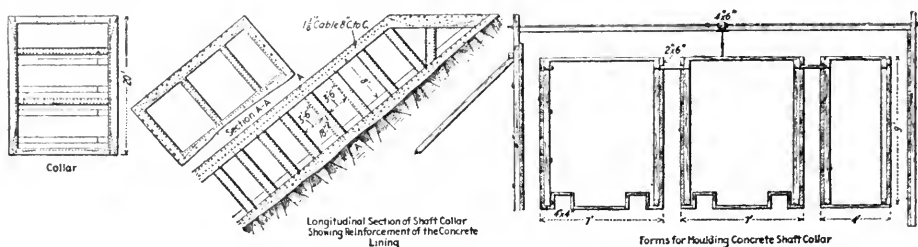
CONCRETE COLLAR OF THE MOHAWK SHAFT.
